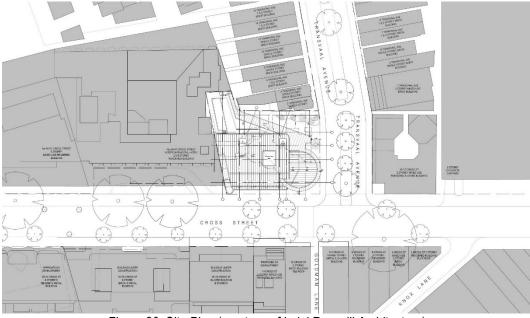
Site Plan (courtesy of Luigi Rosselli Architecture)
